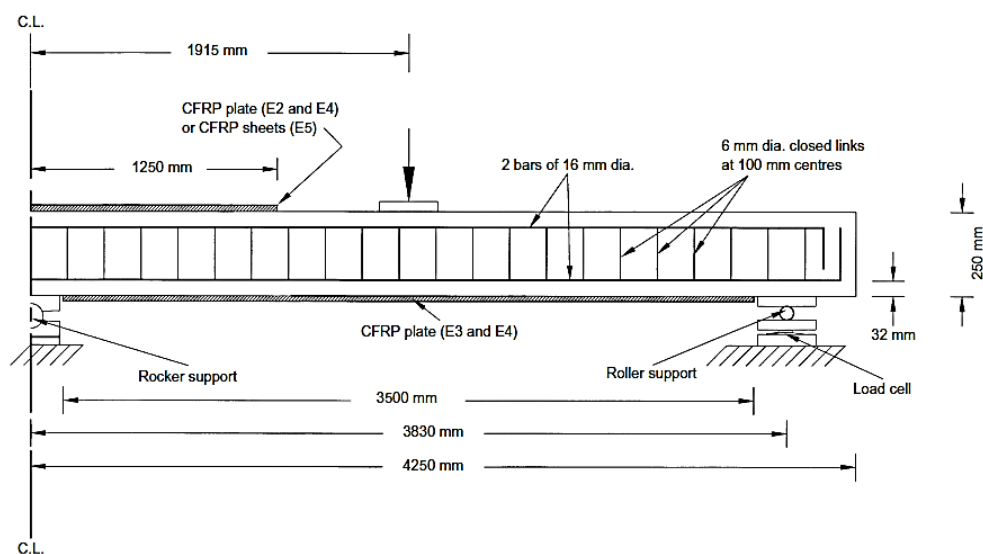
Details of CFRP laminates used in the test specimens (El-Refaie et al., 2003).
